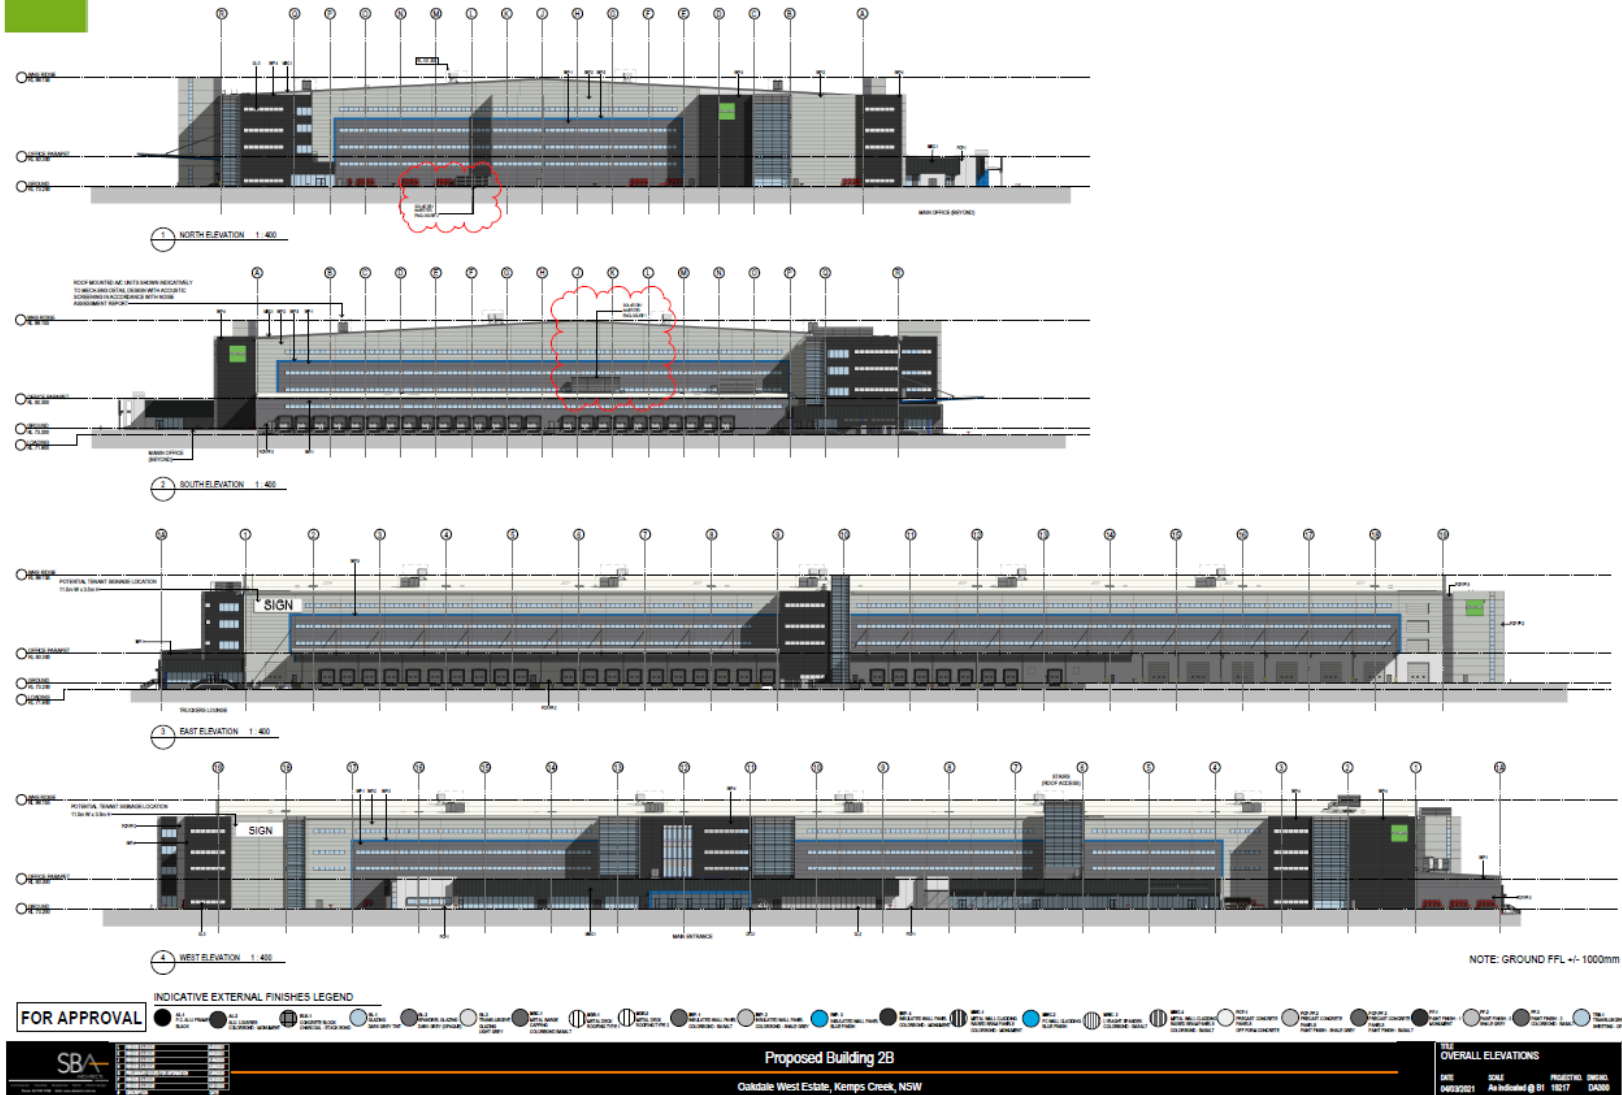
Elevations (Mod 2 – Plan 4 of 4)
